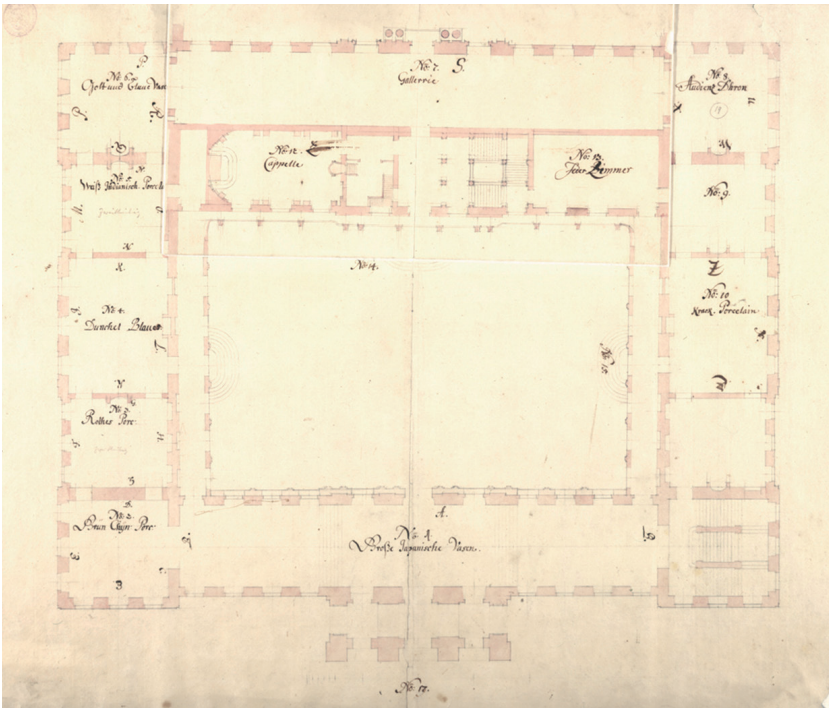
Japanese Palace, floor plan of the upper floor, 1730.
